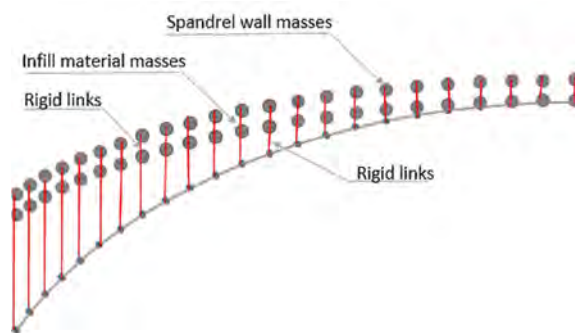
Spandrel wall and infill soil masses disposition on an arch segment
